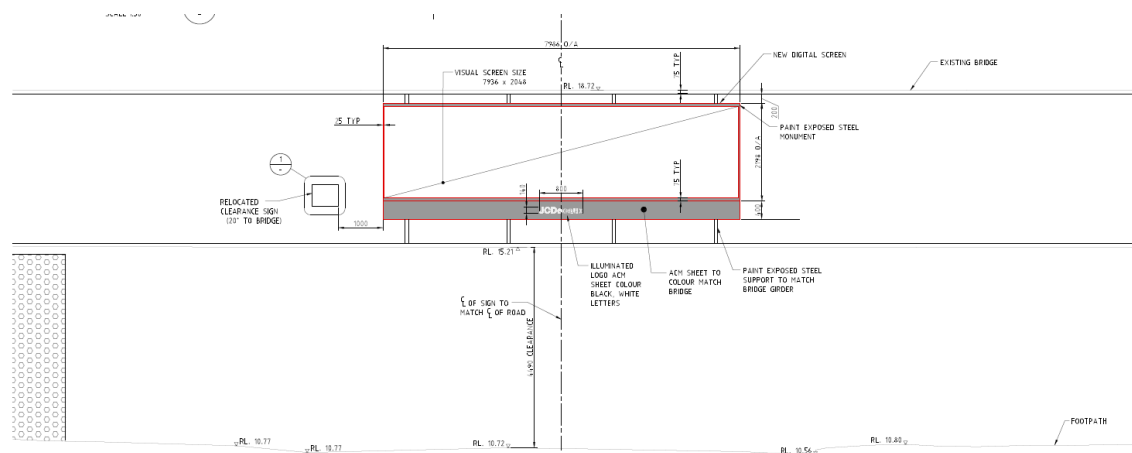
Proposed signage elevation (Source: Dennis Blunt Consulting Engineers)
